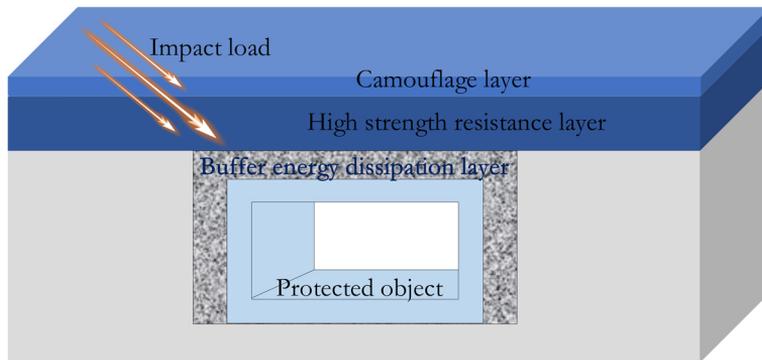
Schematic diagram of a typical multi-level underground protective structure
